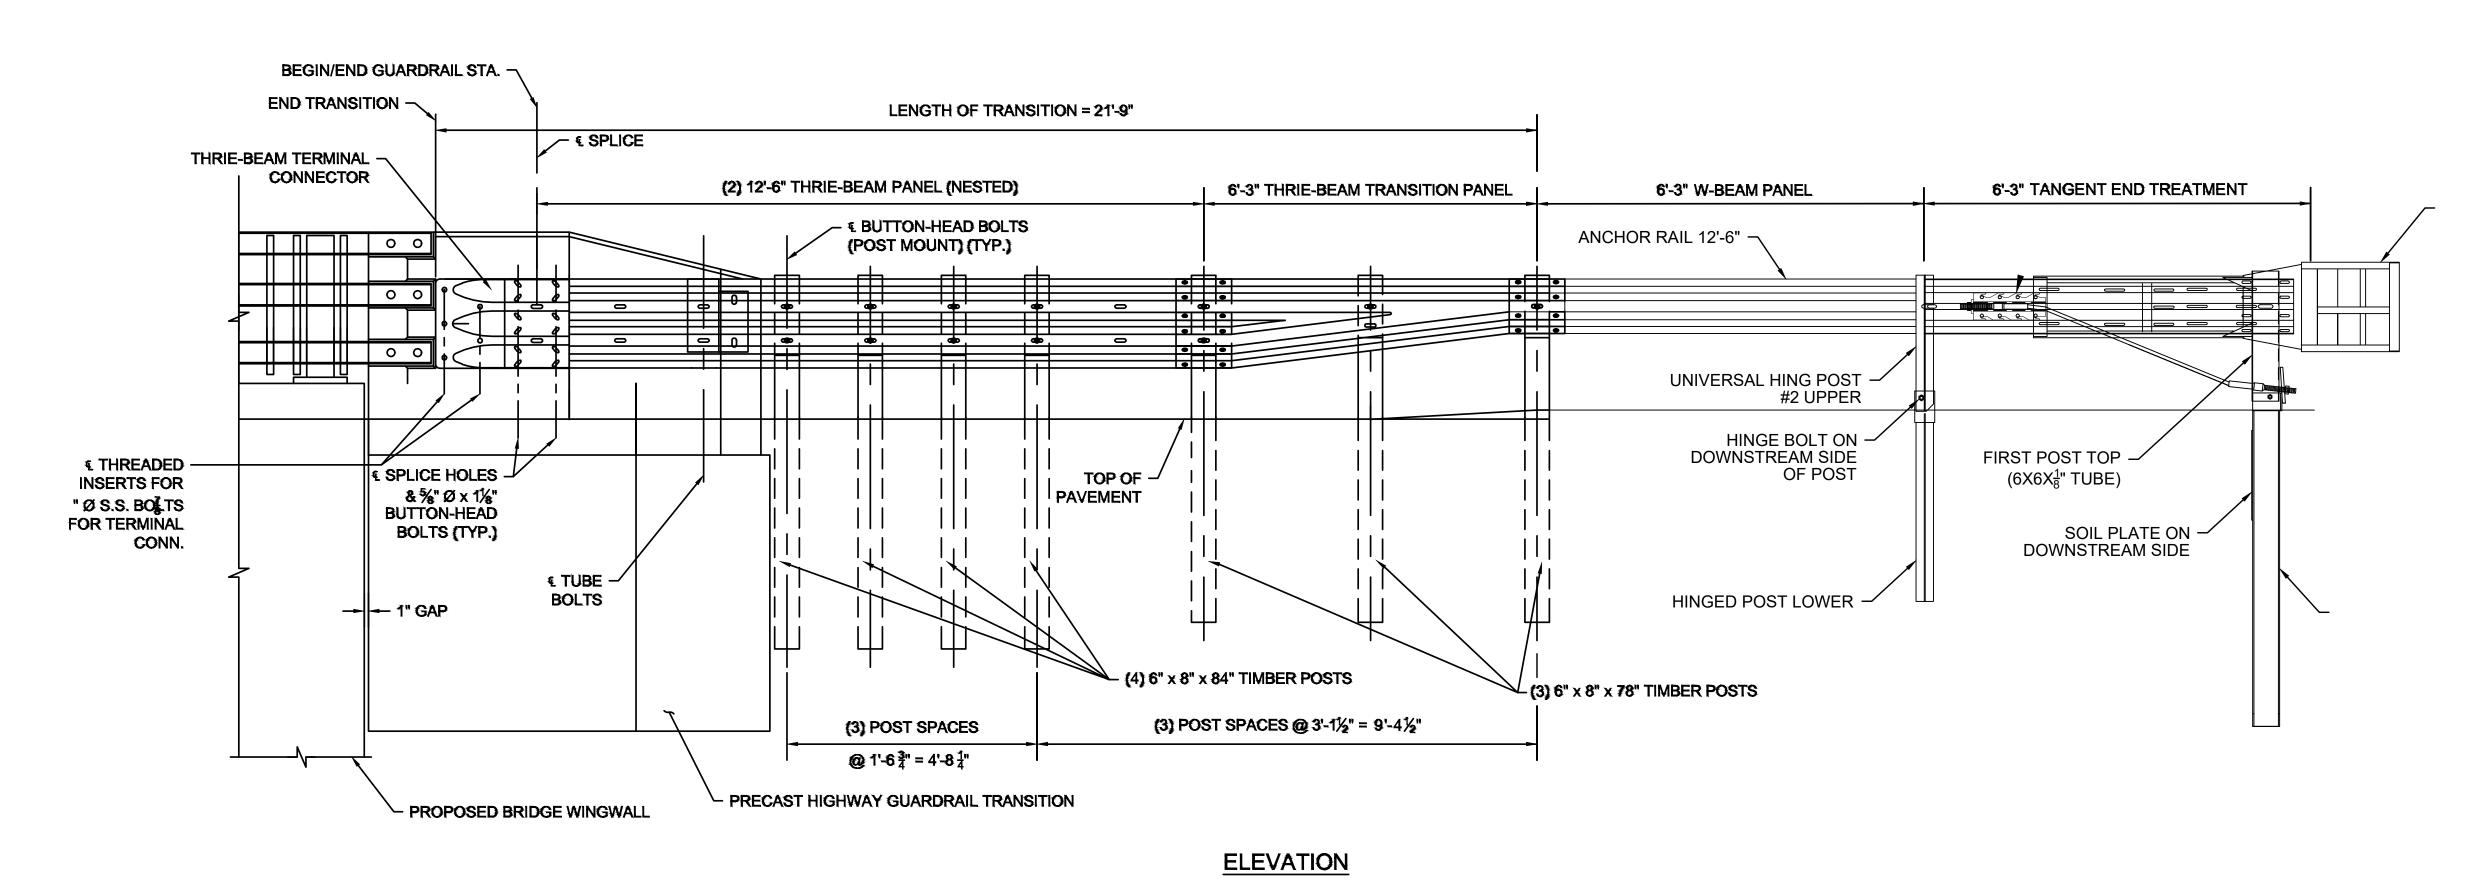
TRANSITION TO BRIDGE RAIL (THRIE BEAM)
